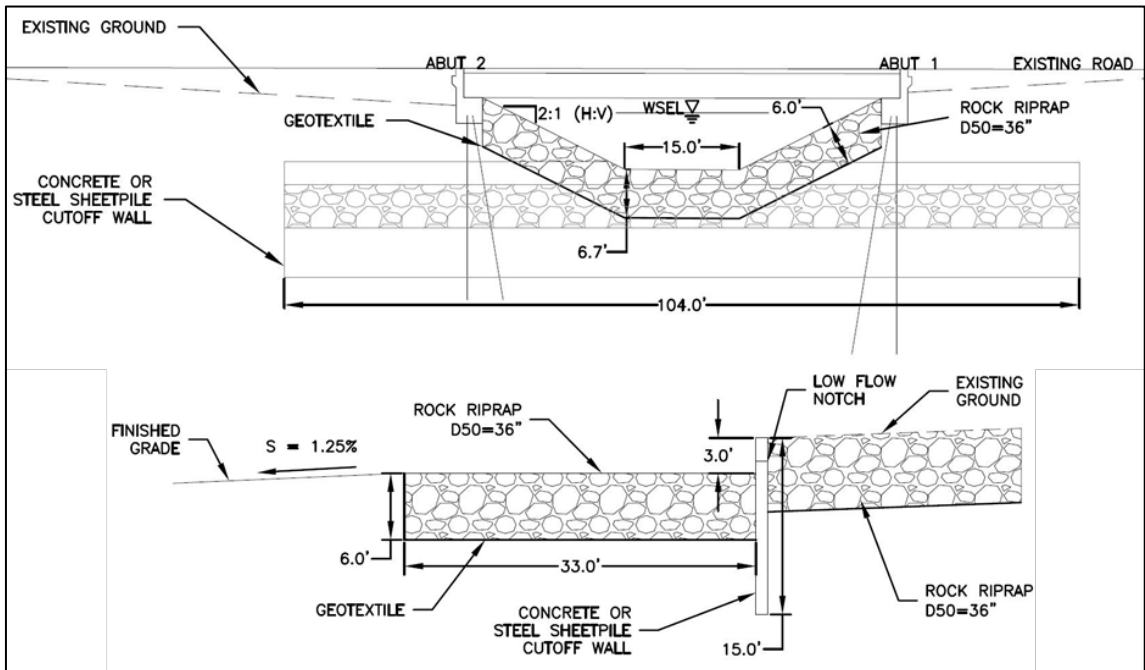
Cross-sectional view of recommended hydraulic scour countermeasures at Bridges F-06-O and F-06-P (above) and a profile view of the downstream drop structure (below)
